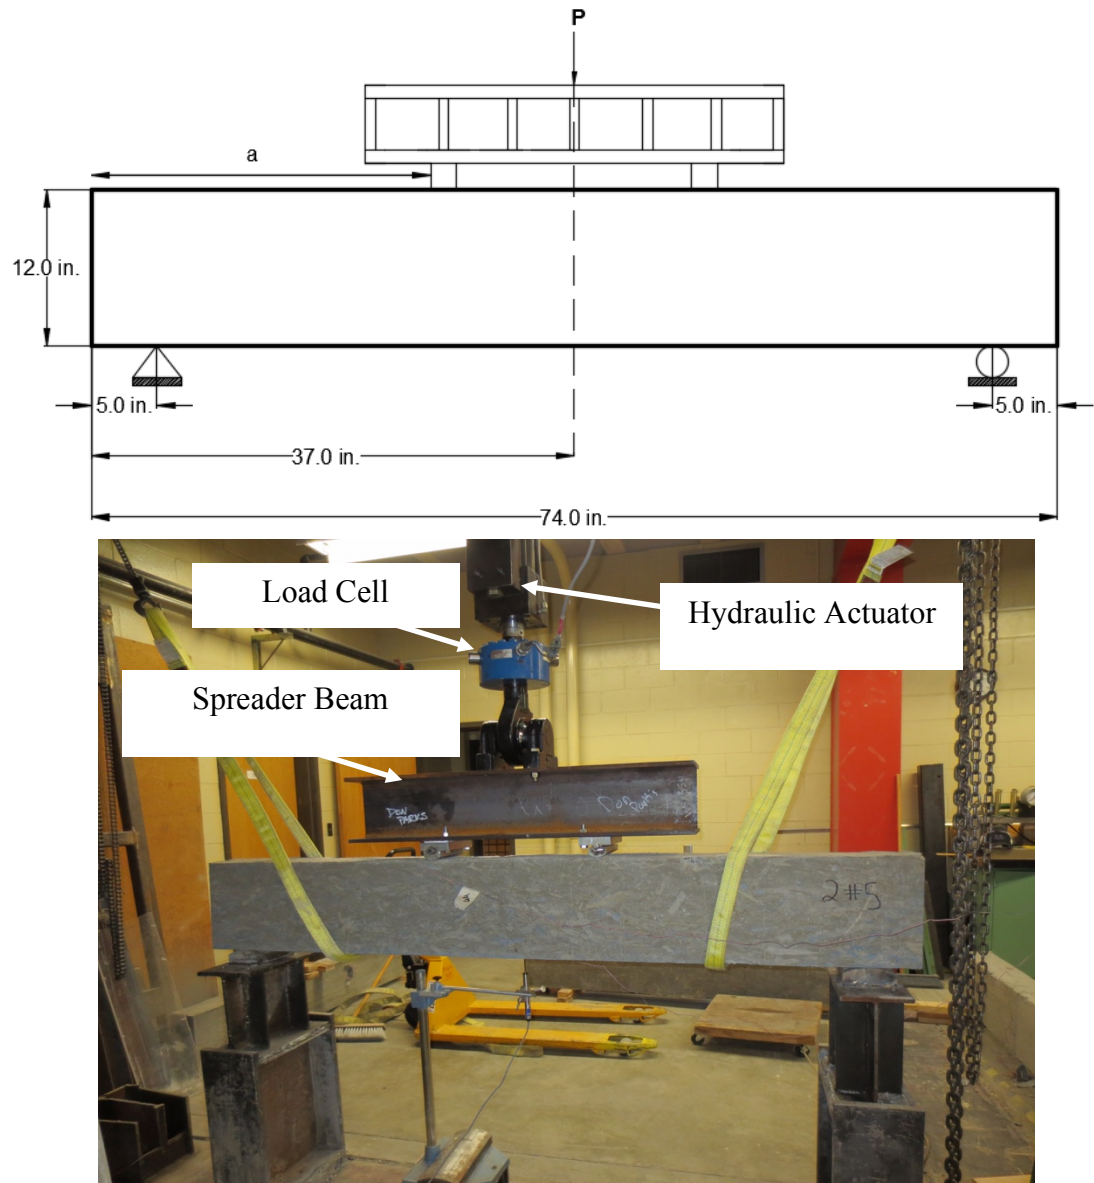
Schematic shows beams setup (a), and actual beam setup
